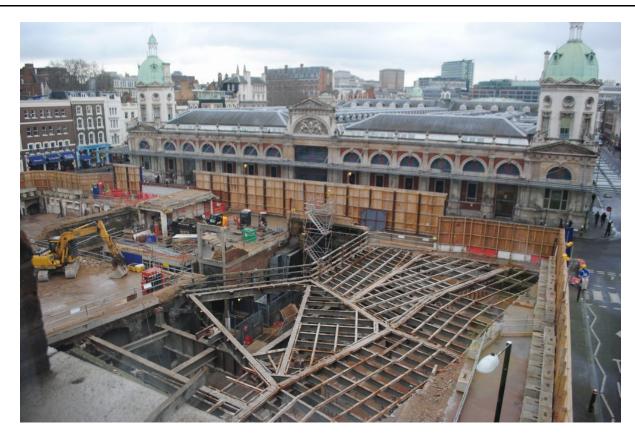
54-64 Charterhouse Street, post demolition showing decking structure upon which the structure sat
